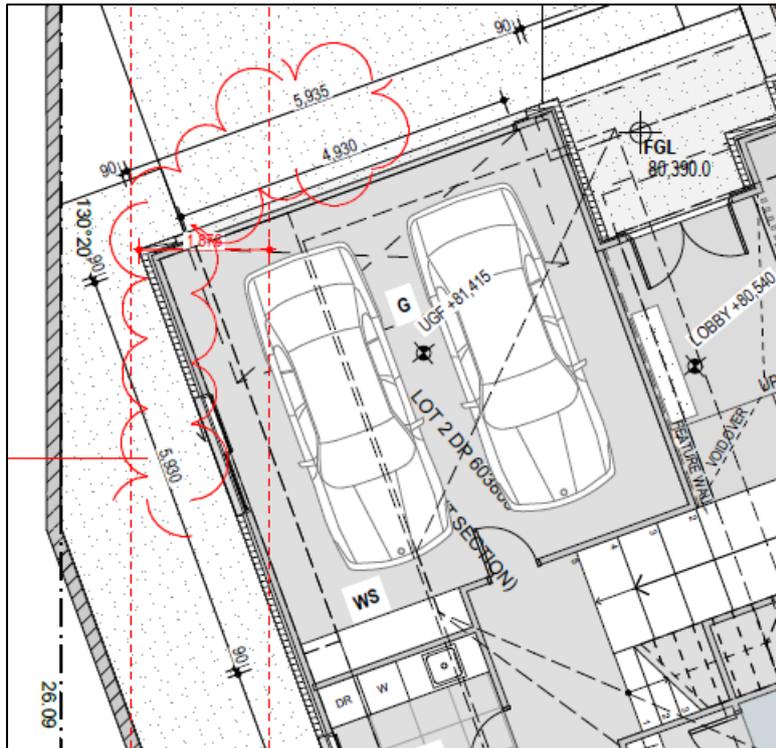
22A SUMMIT DRIVE - GARAGE DIMENSIONS
